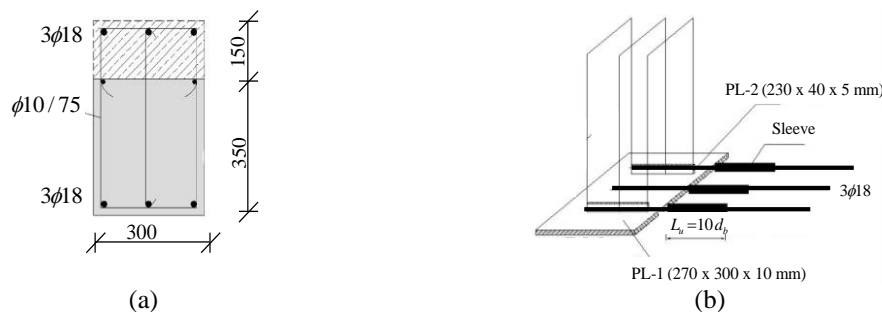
Geometry and welding details for SP3-R specimen: (a) Beam cross section, (b) Unbonding of beam longitudinal rebars (Girgin et al., 2017a)
